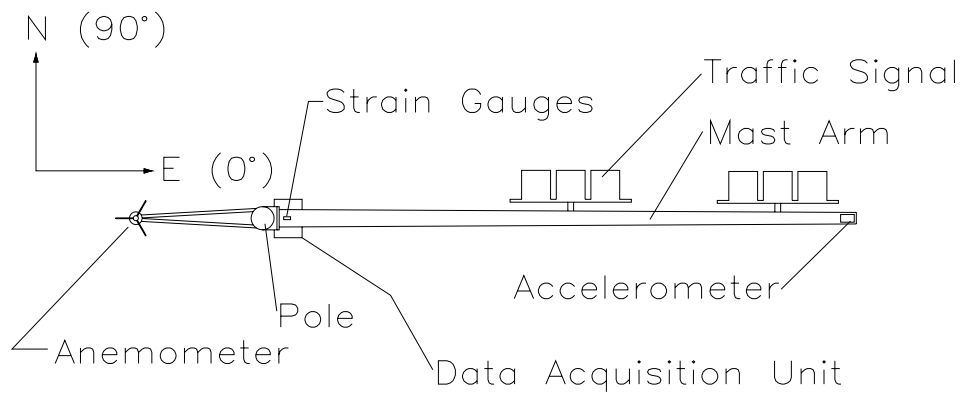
Plan view of equipment layout on typical traffic signal structure (axes shown correspond to anemometer data)
